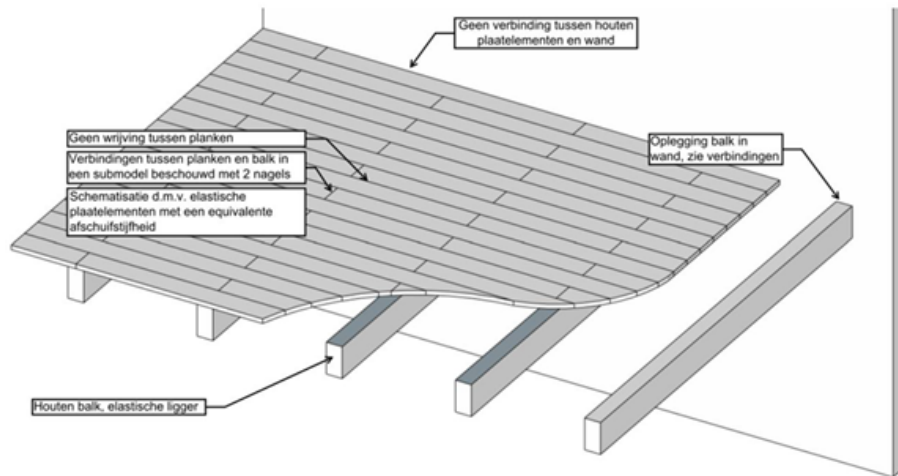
LAYOUT OF ONE-WAY TIMBER FLOORS (BRIGNOLA, PODESTA, AND PAMPANIN, 2008)
